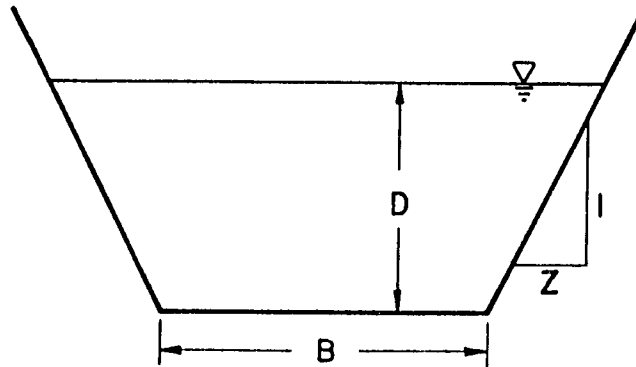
The trapezoidal channel cross section showing the geometric parameters used in Eqs. 5 - 7.
